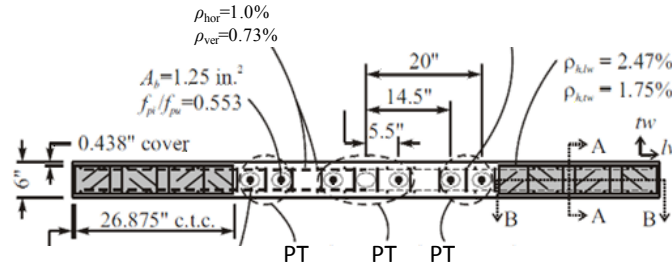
Typical wall cross section at base of hoop-confined wall panel (from Perez et al. 2004)
